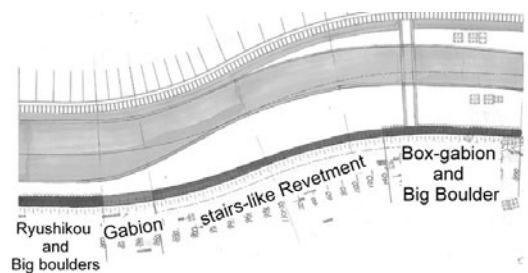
Layout of revetment (0k+260 to 1k+300)
